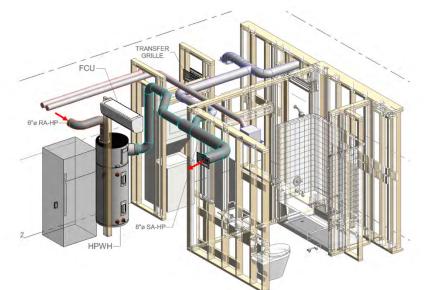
Warm Air Inlet and Cool Air Outlet
